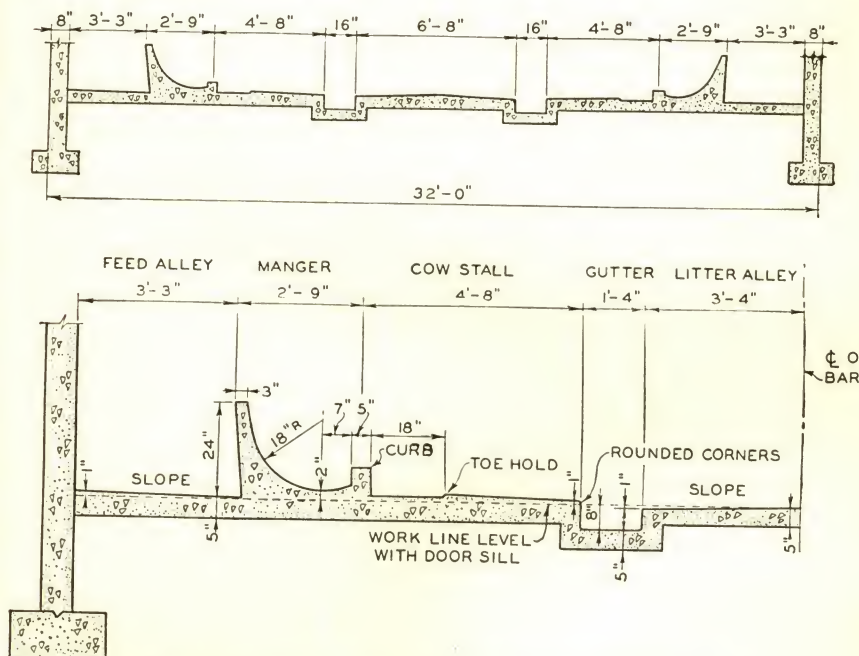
Dimensions for a 32' 0" Dairy Barn Floor and Details
